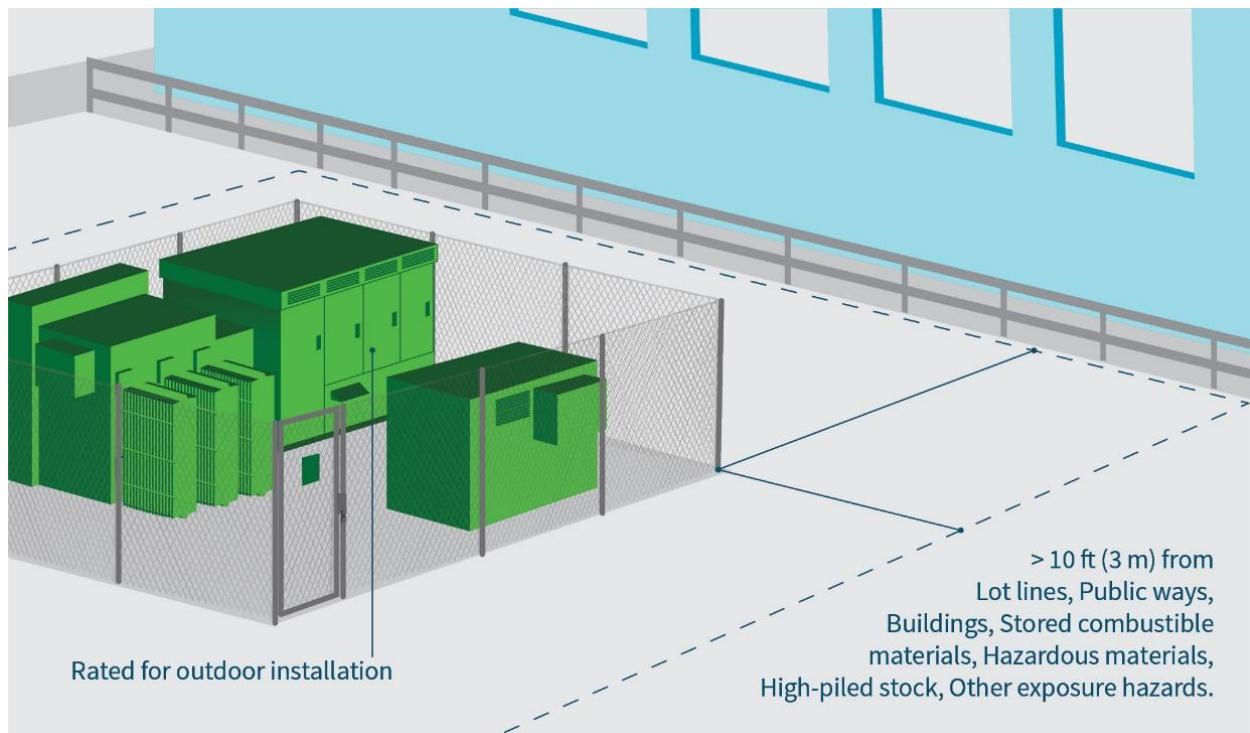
An Example BESS System Installed on the Exterior of a Building
